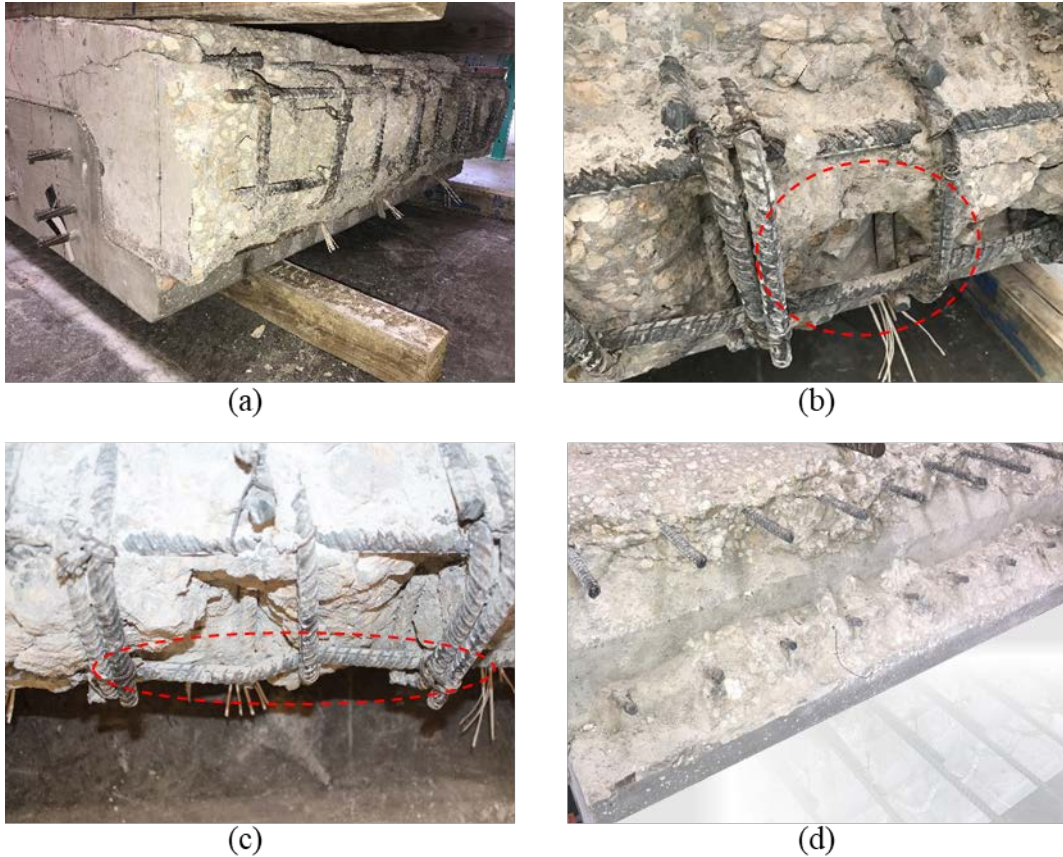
(a) Unloaded side of control specimen after failure, (b) Concrete rupture inside caged matrix, (c) Longitudinal rebar bend, and (d) Bond loss of CIP deck
